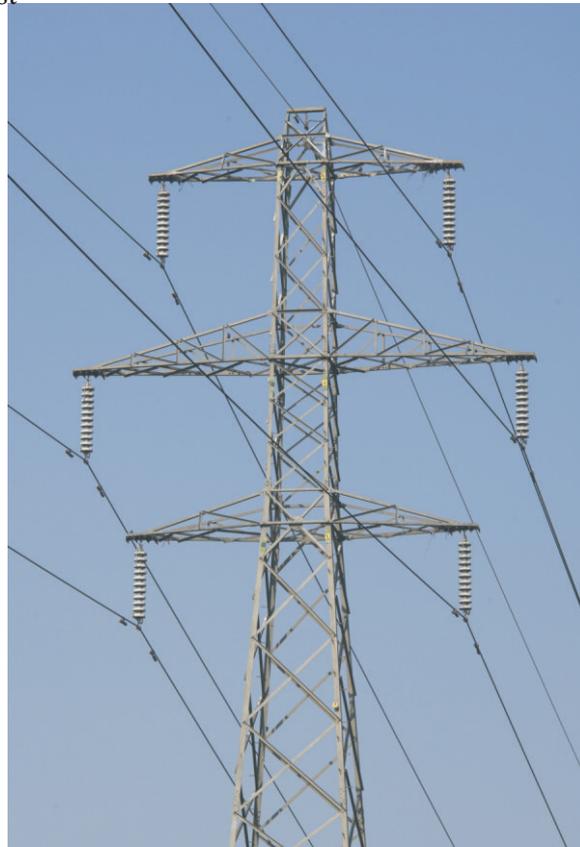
The arrangement of cross arms on suspension tower, EDFE100. Looking north-east
